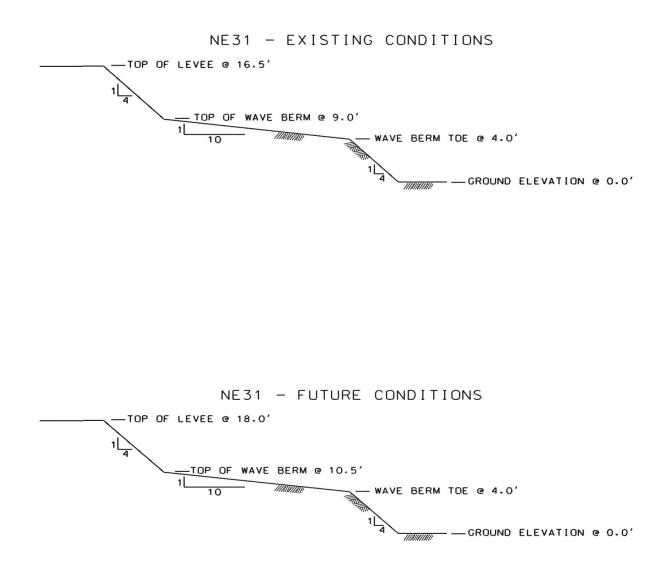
Typical Levee Design Cross-sections South Point Transition Levee (NE31)
